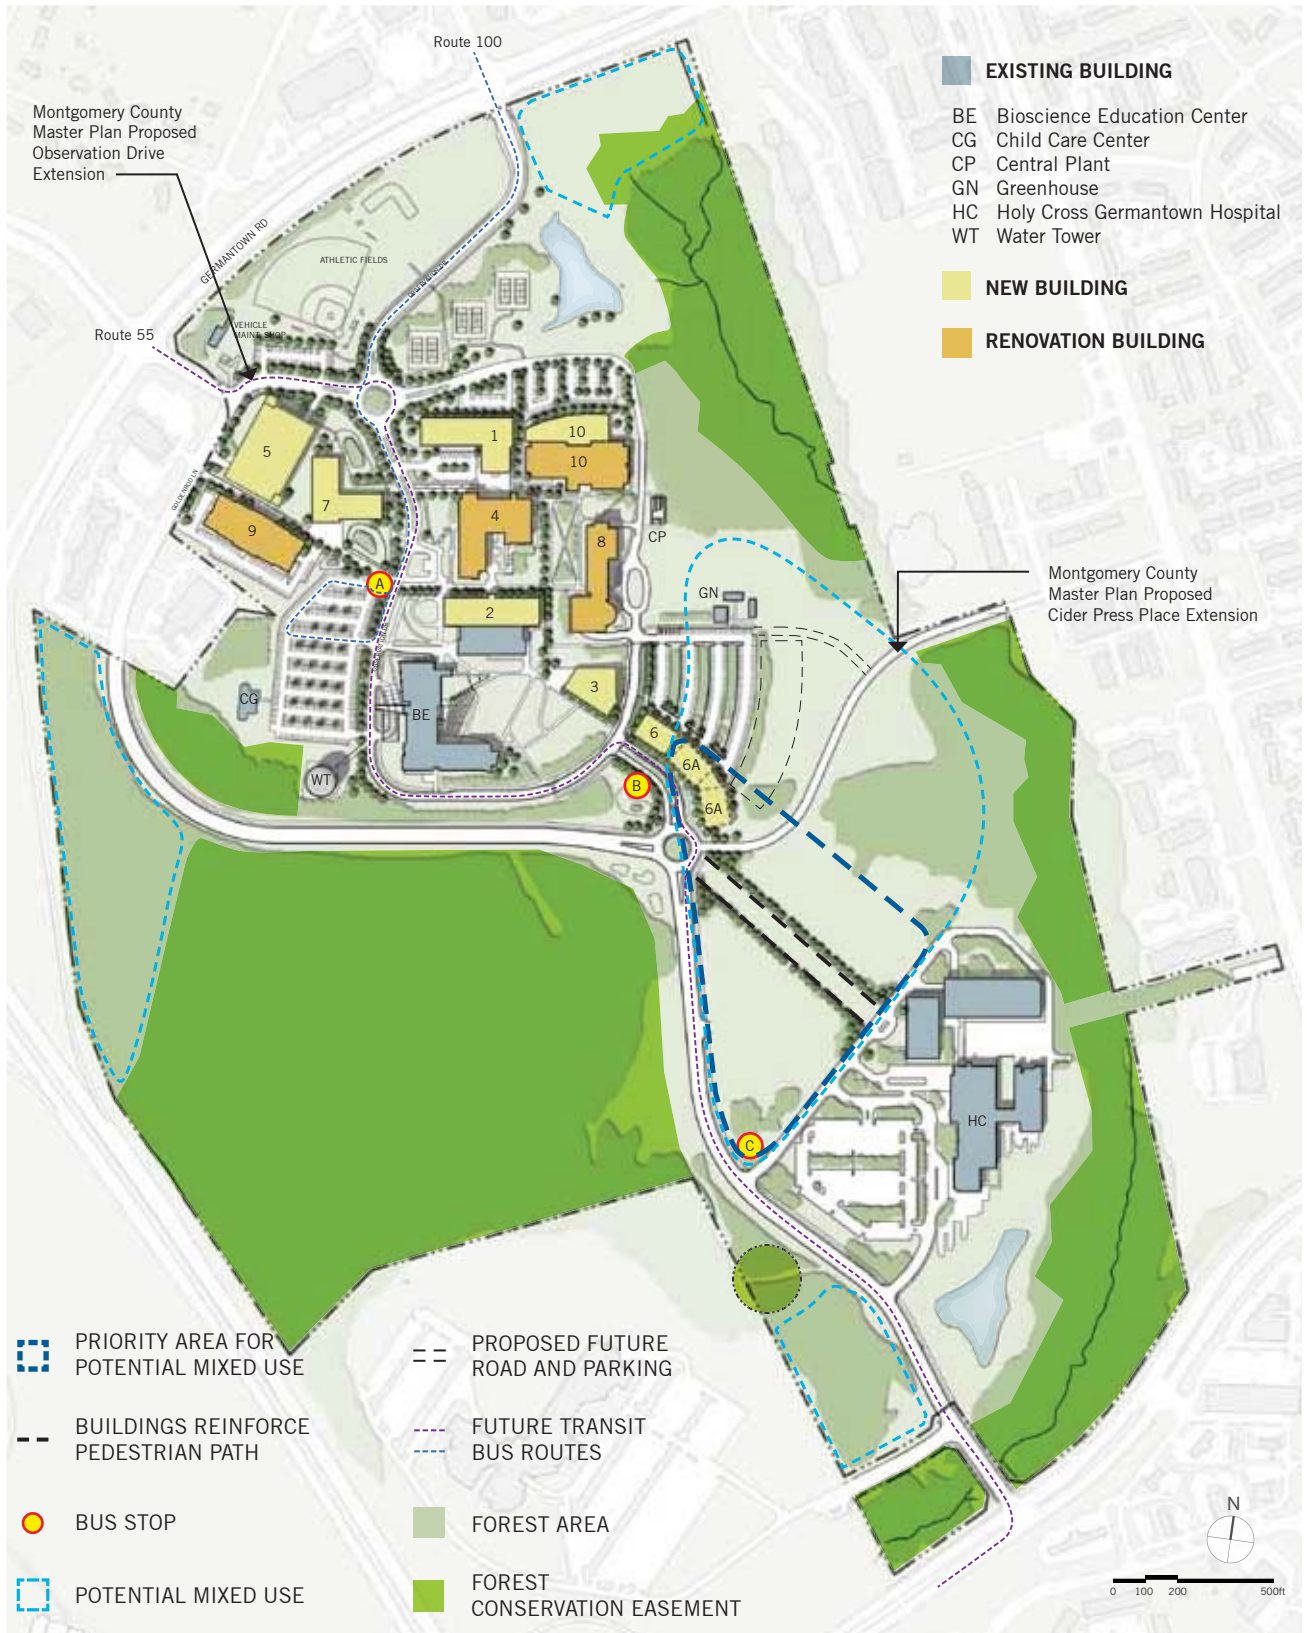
GERMANTOWN CURRENT CAMPUS PLAN
